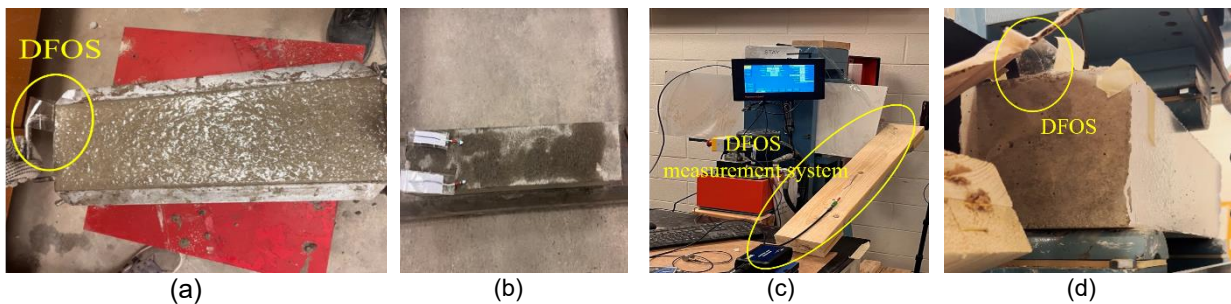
(a) Freshly casted beam; (b) Demolded beam; (c) & (d) Center-point bending test setup.
